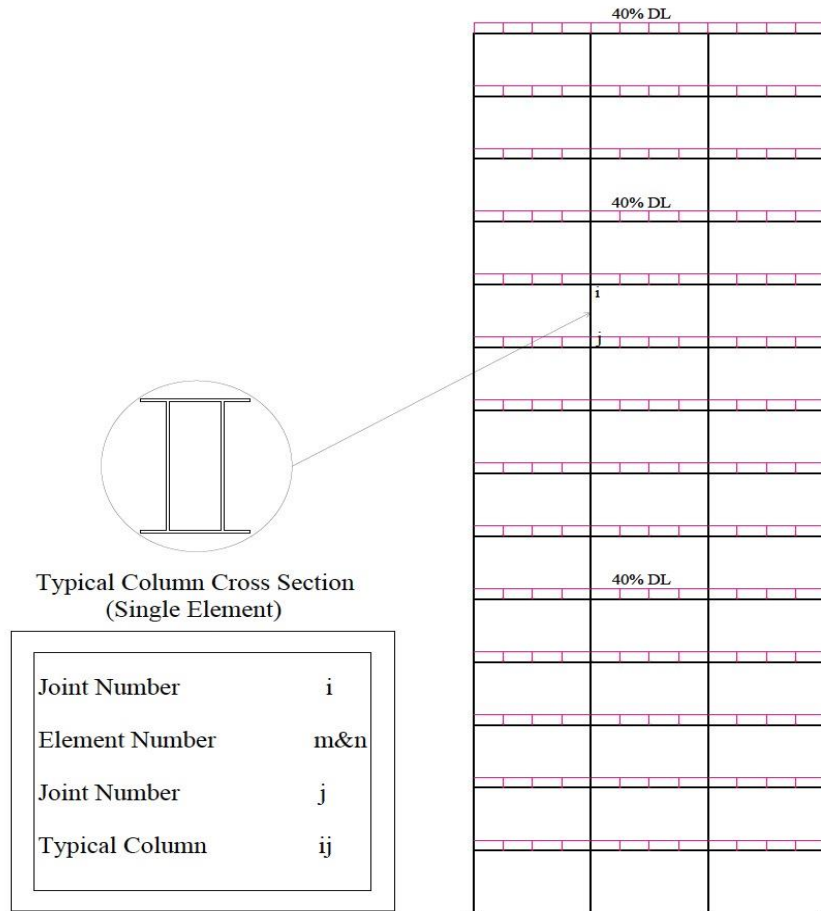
Typical Steel Frame (with or without “X” Bracing)
